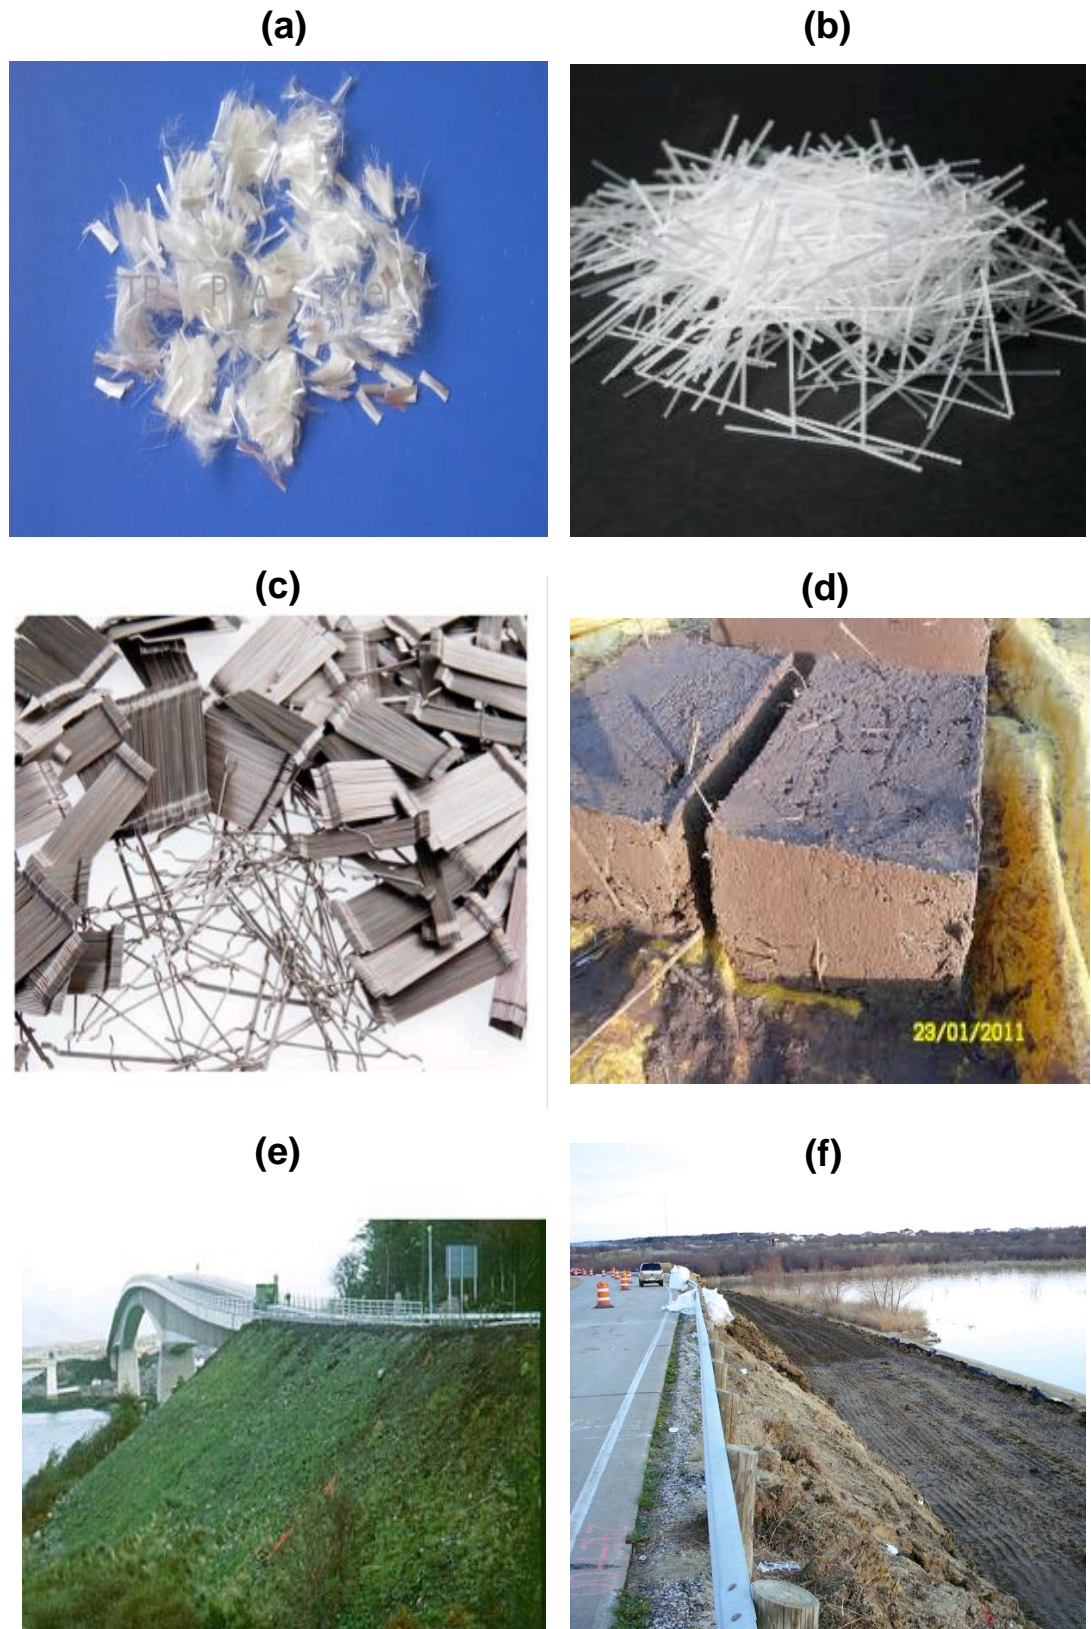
Different fibre types; (a) and (b) polypropylene (c) steel. Fibre reinforcement applications: (d) adobe style brick, (e) sloped bridge embankment, (f) roadside embankment.
